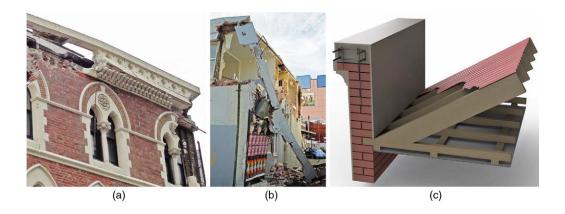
Examples of retrofit with the addition of a concrete bond beam at the top of the parapet: (a) typical concrete bond beam; (b) common failure; (c) design scheme.
